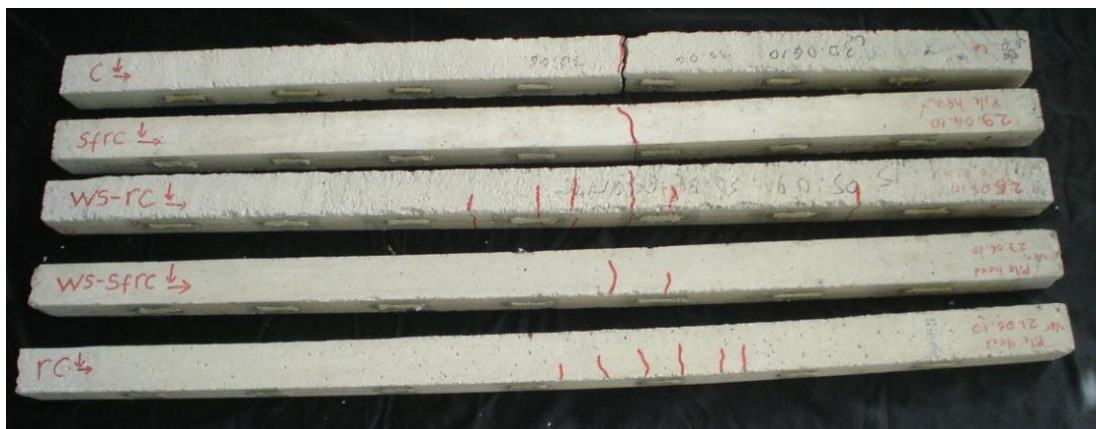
Damaged model piles after the test of lateral-axial loading
